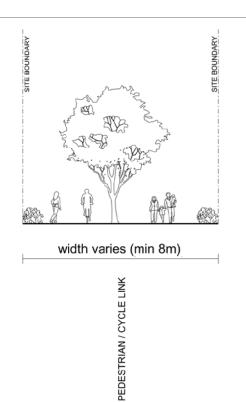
Danks Street South - Street Section - Park Edge (9m shared zone)
